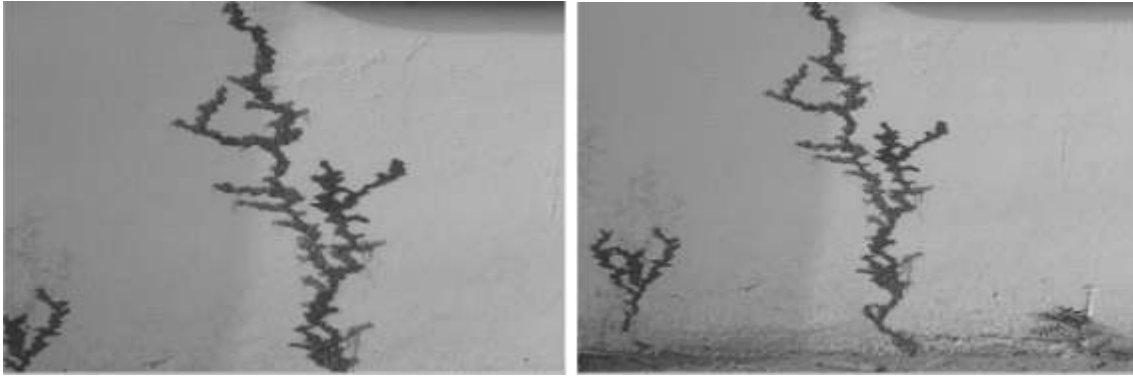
Termite Moulds on the Walls and Façade of The Institution's Building
